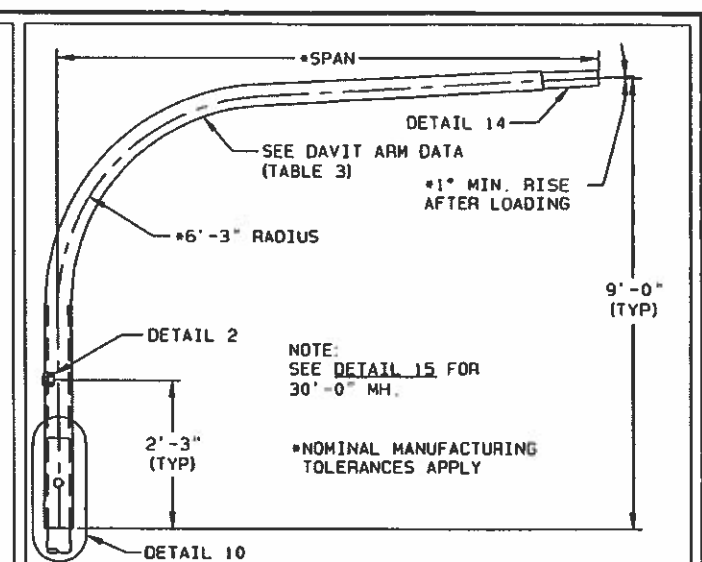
ELBOW TYPE LUMINAIRE ARM
